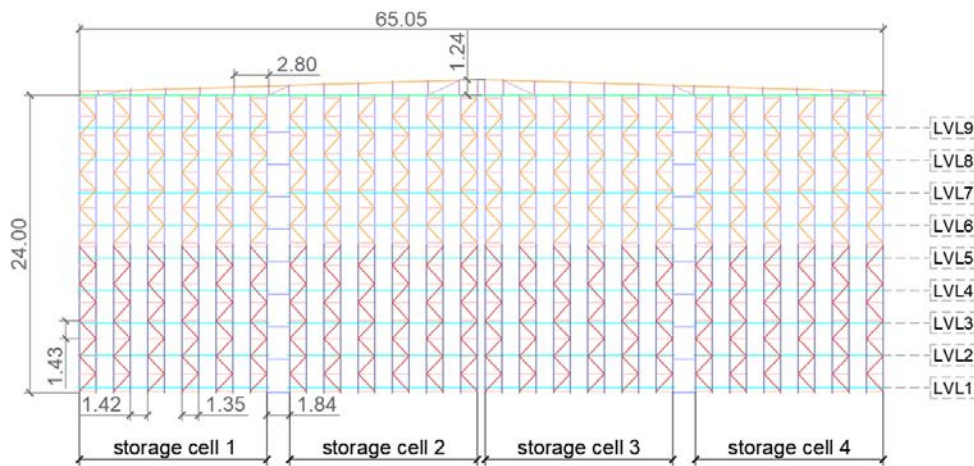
Cross-aisle view of the multi-depth Case Study 1, consisting of 24 “K-type” upright frames and a connecting shallow roof truss (units in meters).
